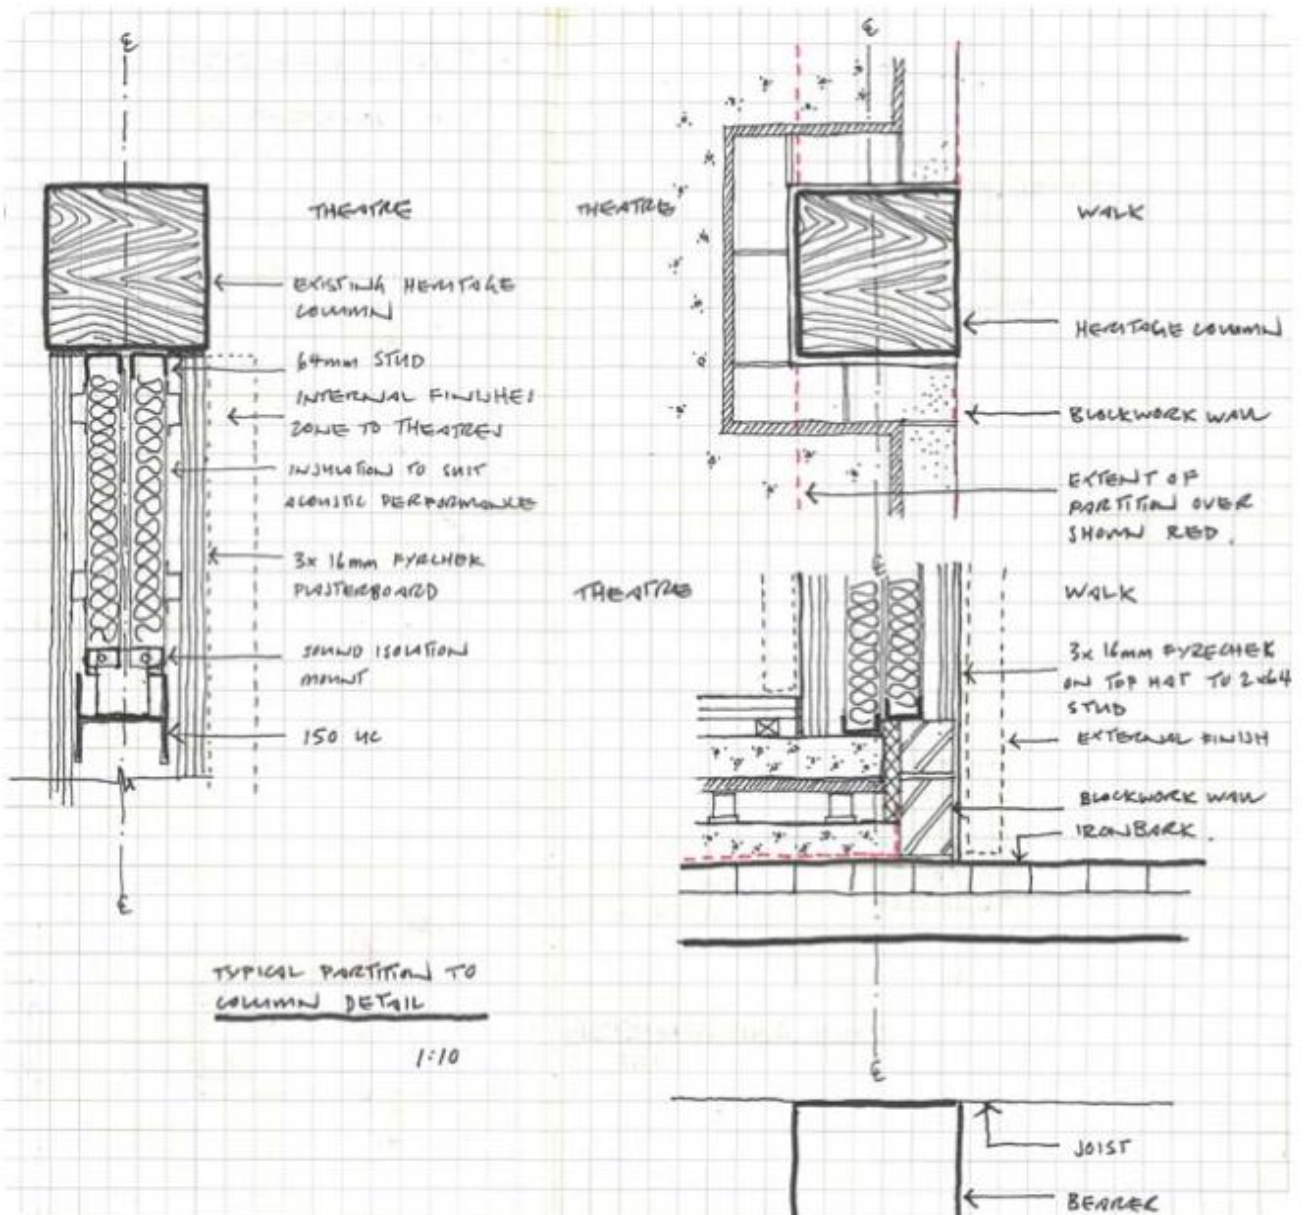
Typical detail of acoustic wall. Sketch provided by Hassell showing separation from the old structure and removable wall treatments
